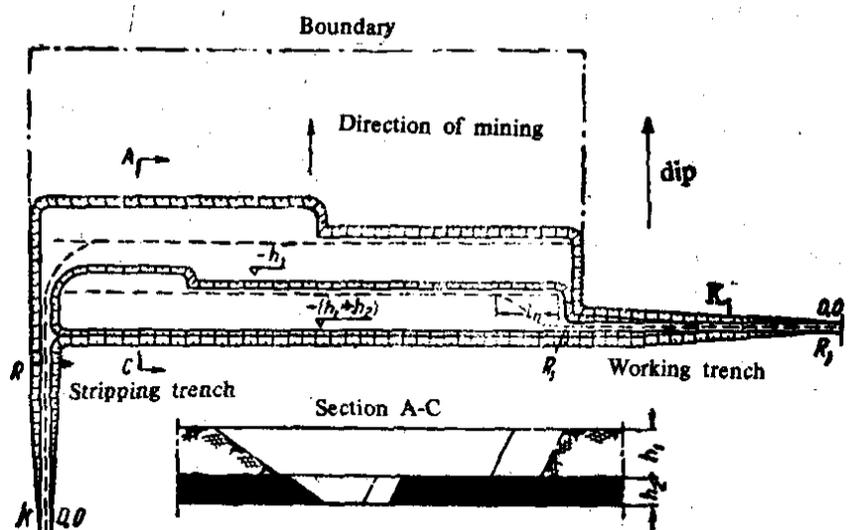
Layout of a mechanised quarry with separate trenches
